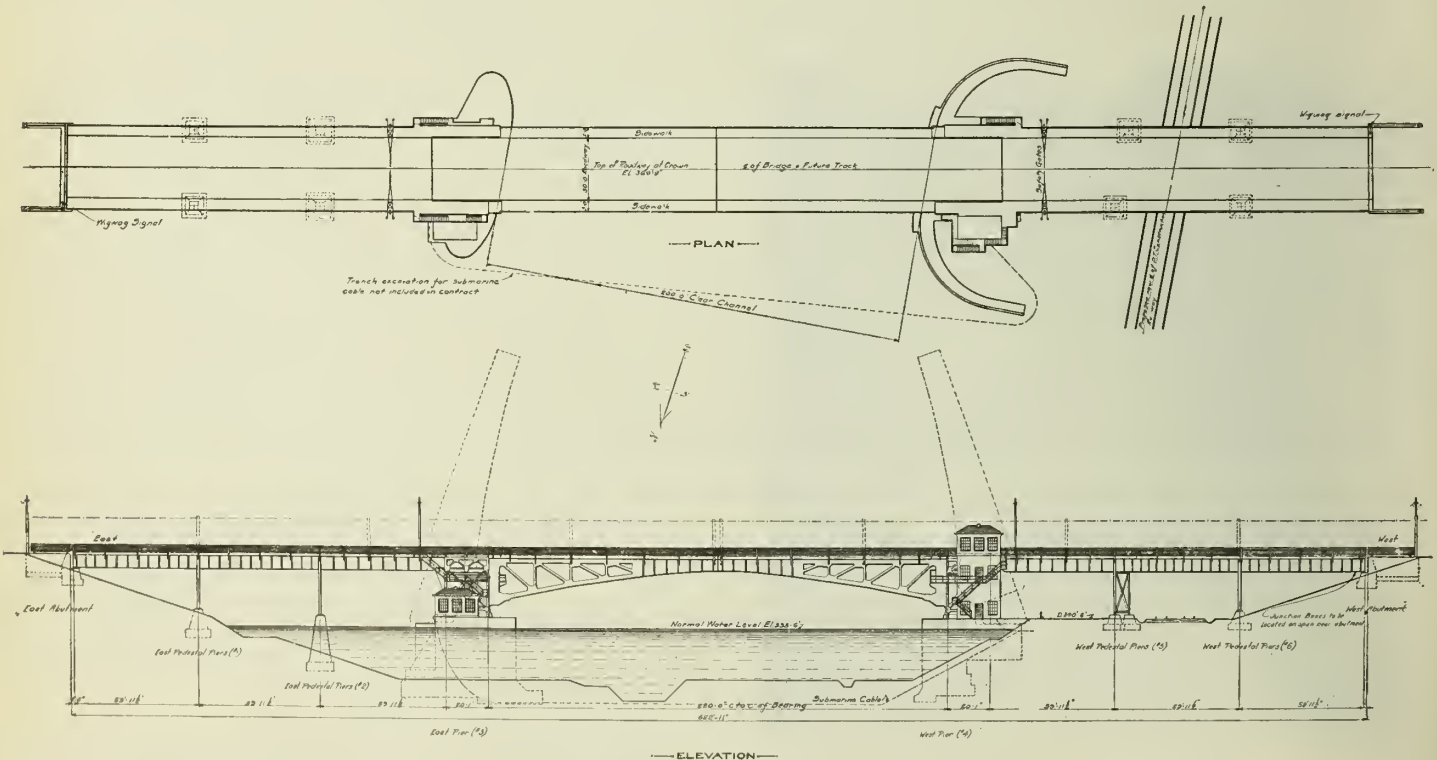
Roller Lift Bridge, Queenston Road—General Plan.
